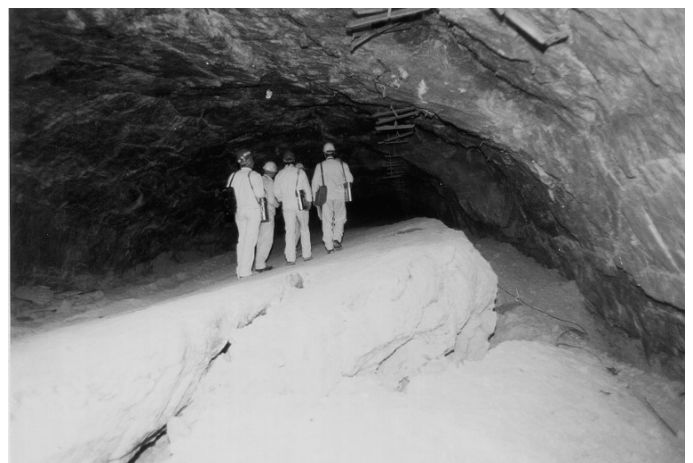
Extreme floor lifts caused by numerous bedding planes in the floor.
